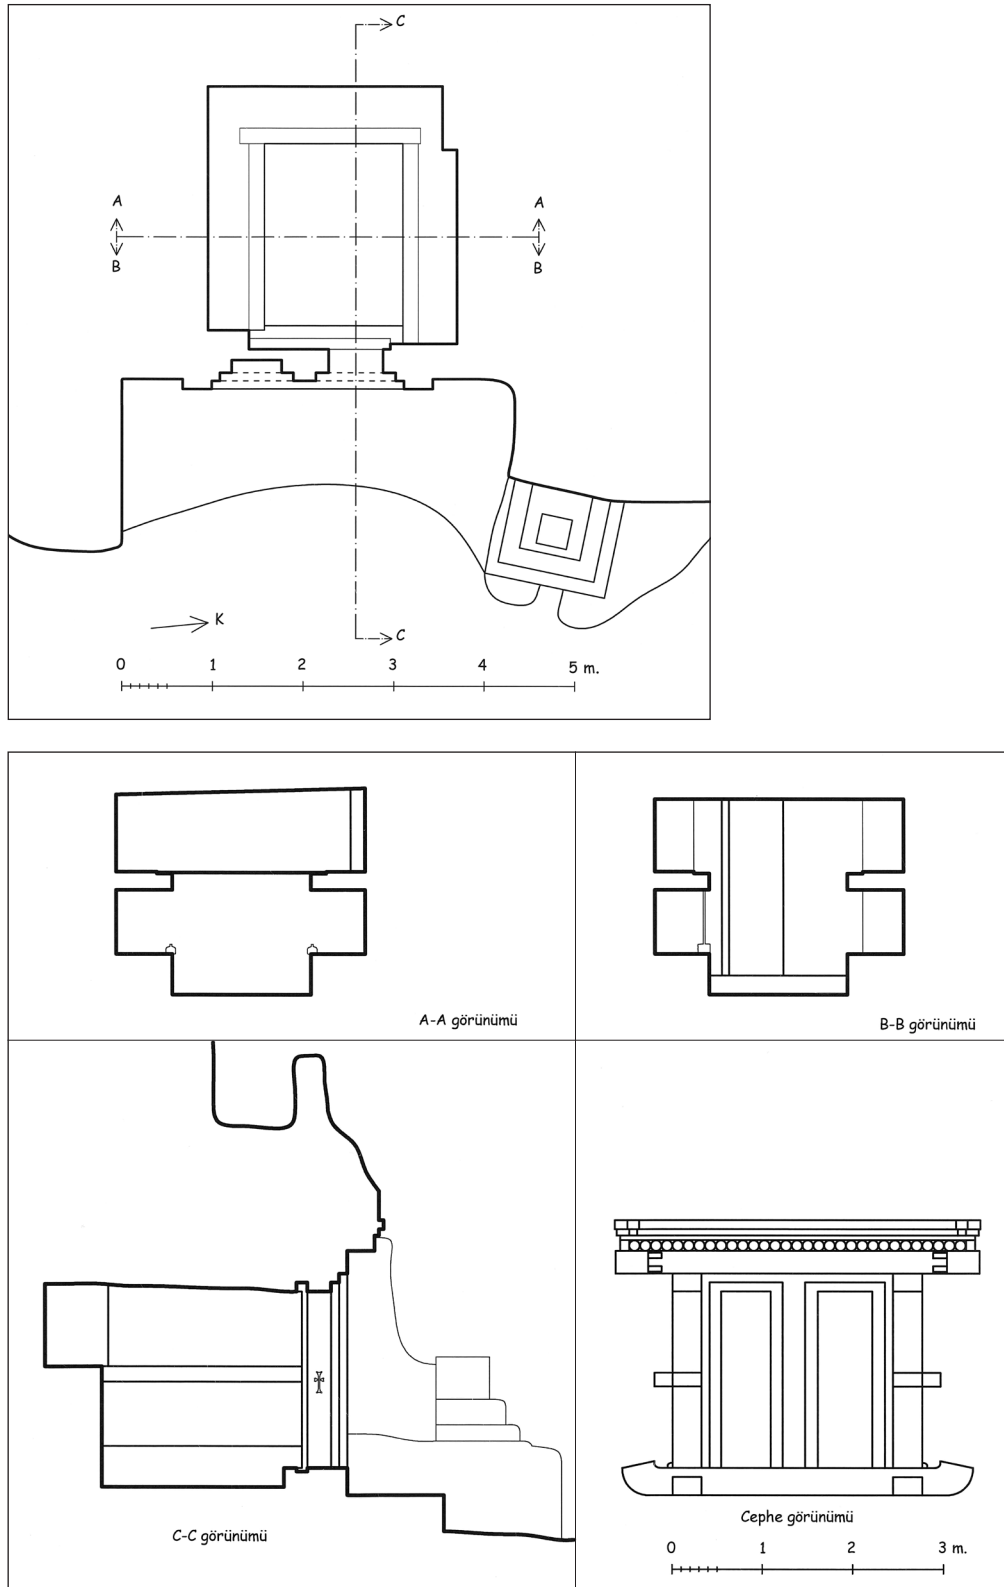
Rock-cut tomb 1, plan and view drawings.
